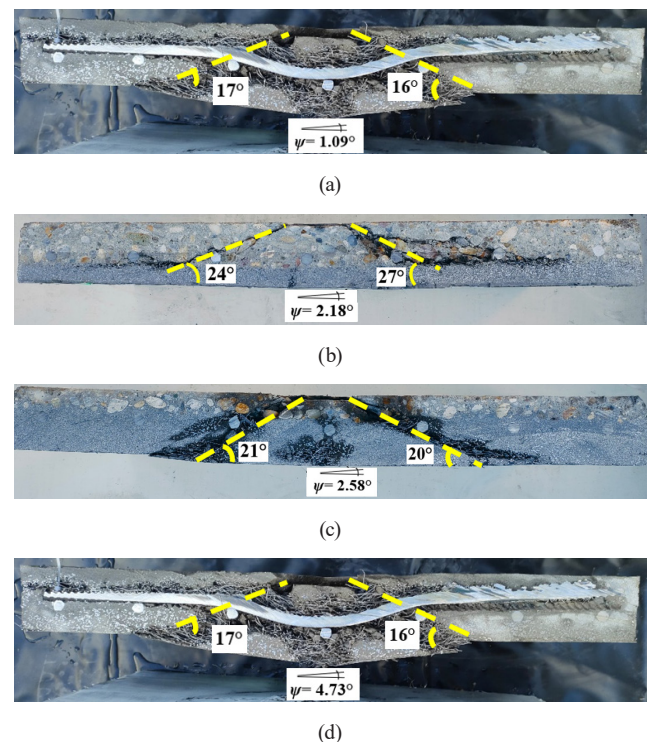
Inclination of cracks and rotation of slabs: (a) Specimen N; (b) Specimen N-ST60-2; (c) Specimen N-ST60-4; (d) Specimen S
